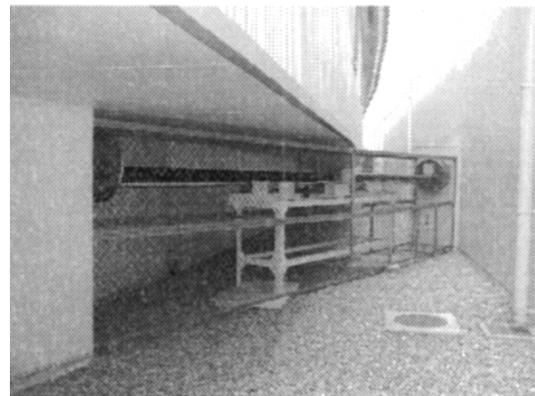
Connecting tubes for vacuum and electric wires between storage ring building (left) and RI building (right)
